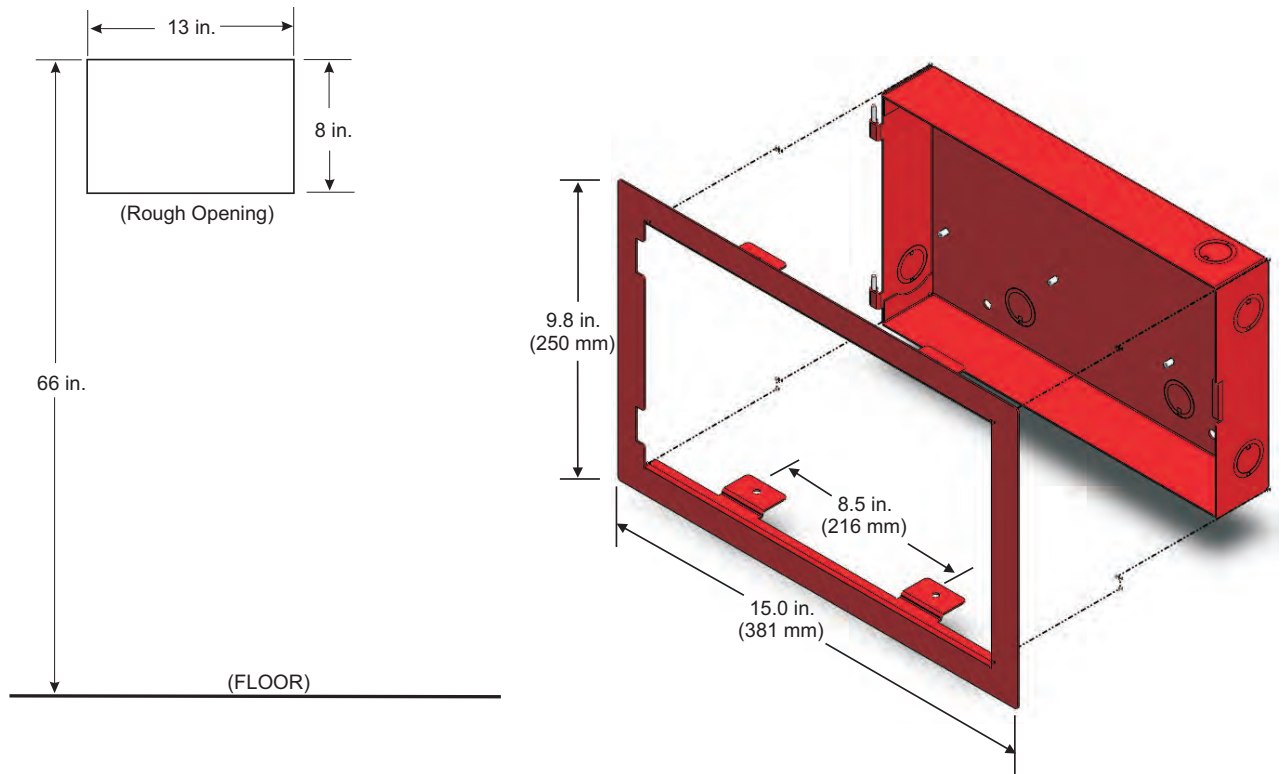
Semi-Flush Mounting of Remote Enclosure (shown without RDCM or R-LAM modules)
